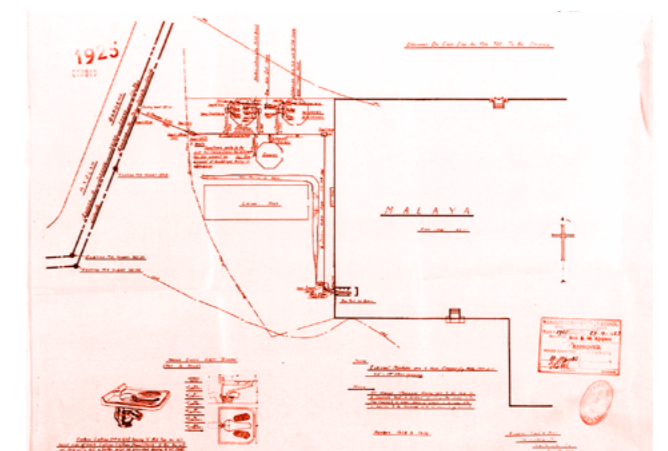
Drainage plan of the Malaya Pavilion, highlighting "Living Hut". Brent Archives Ref: BLD/WEMB/1/1769-1863/49.
